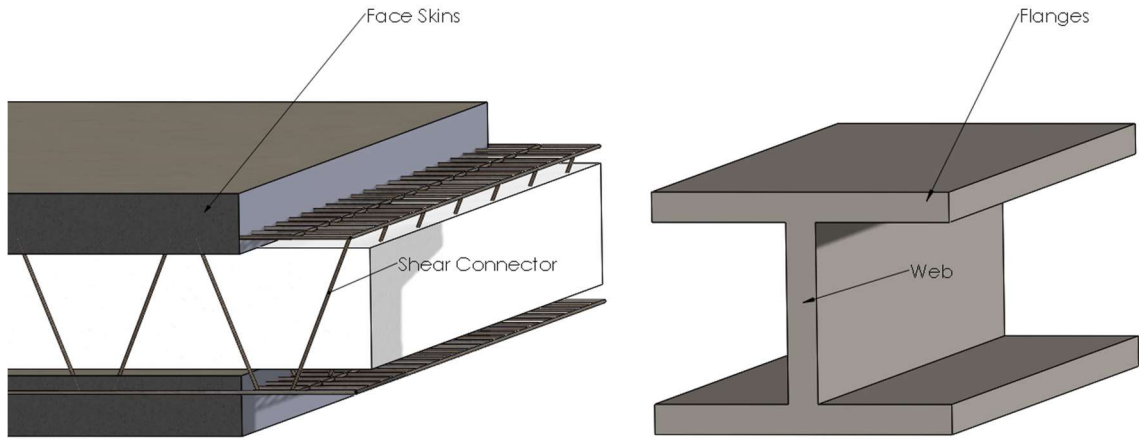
Construction of Sandwich Panel Compared to an I Beam.
